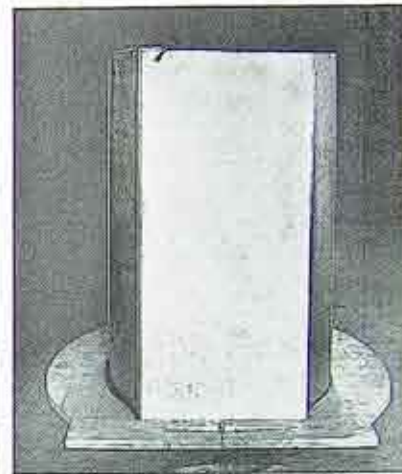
, Showing Completed Form, Covered with Galvanized Sheetting and Ready for Placing in Position in Manhole Preparatory to Pouring in the Concrete.
